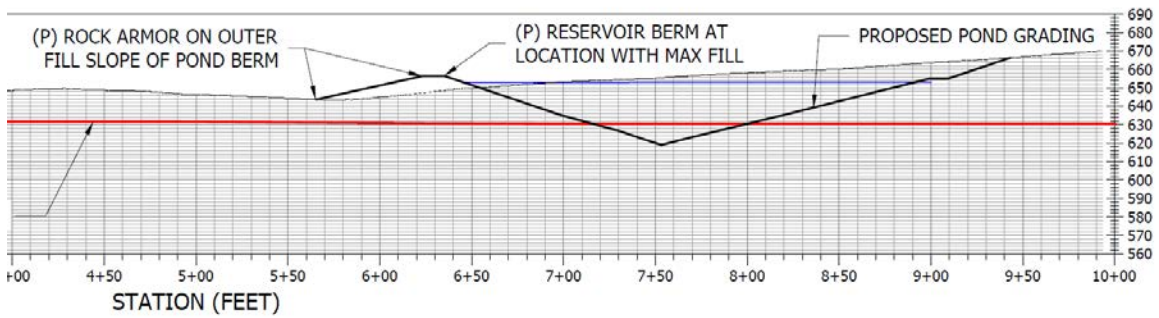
Depiction of maximum water surface elevation above the toe of the berm, figure cropped from Final 65% Plans Sheet 6.
